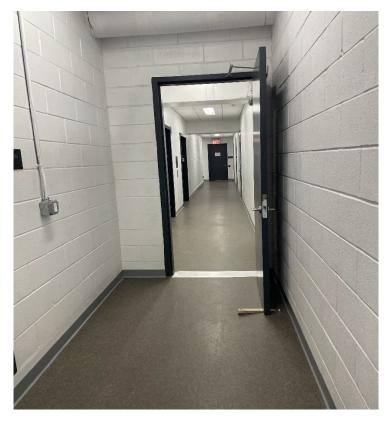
Photo of the concrete slab in a hallway of the Site's cellar.
